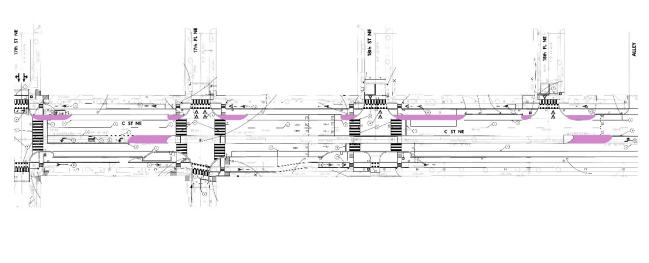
April Modifications to February 65% Design—17th Street NE to 18th Place NE
